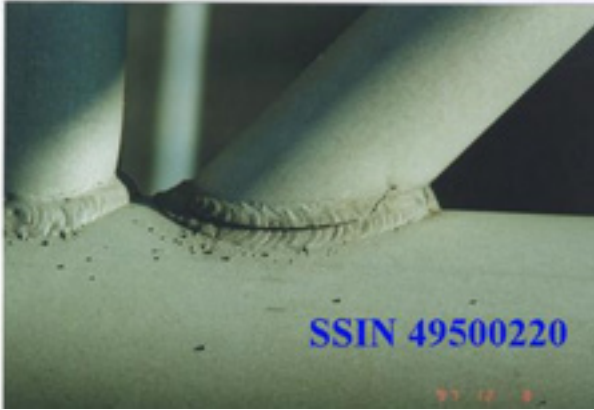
Cracked weld in an overhead tubular sign truss
